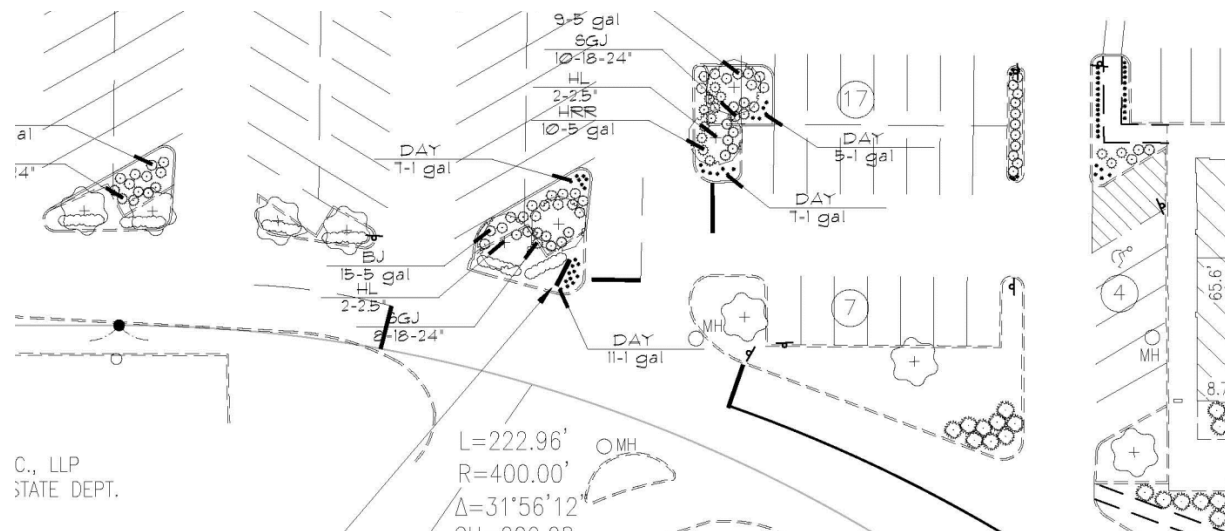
Detail of Landscape Plan showing the enlarged parking lot islands to replace the loss of greenspace of the median
